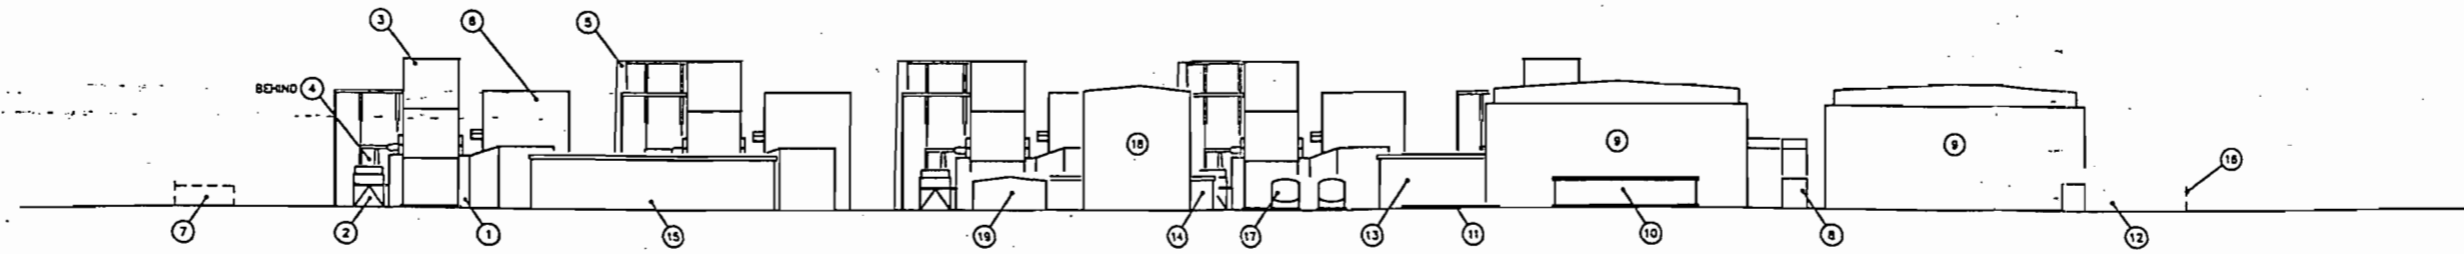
SITE ELEVATION LOOKING EAST FOR THE PROPOSED OLEANDER POWER PLANT
